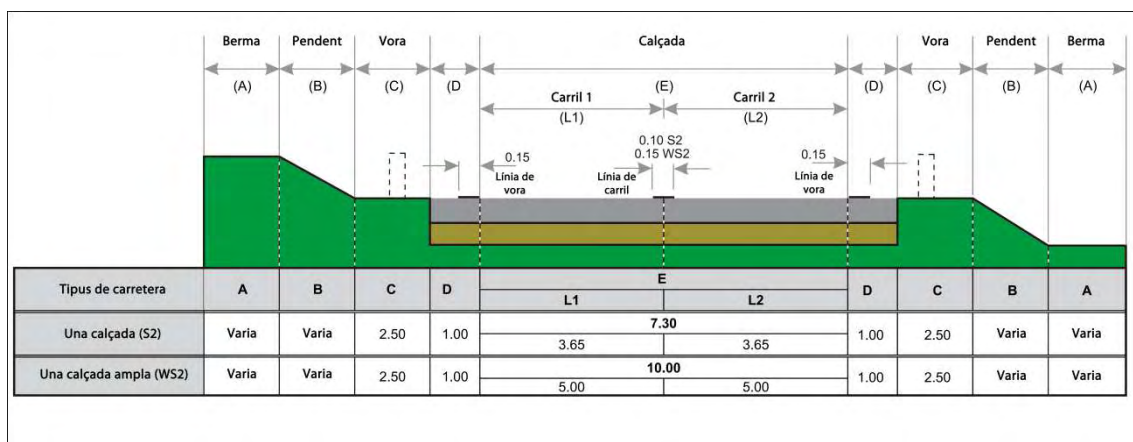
Dimensions of Cross-Section Components for Rural All-Purpose Roads Mainline (Single Carriageway)
